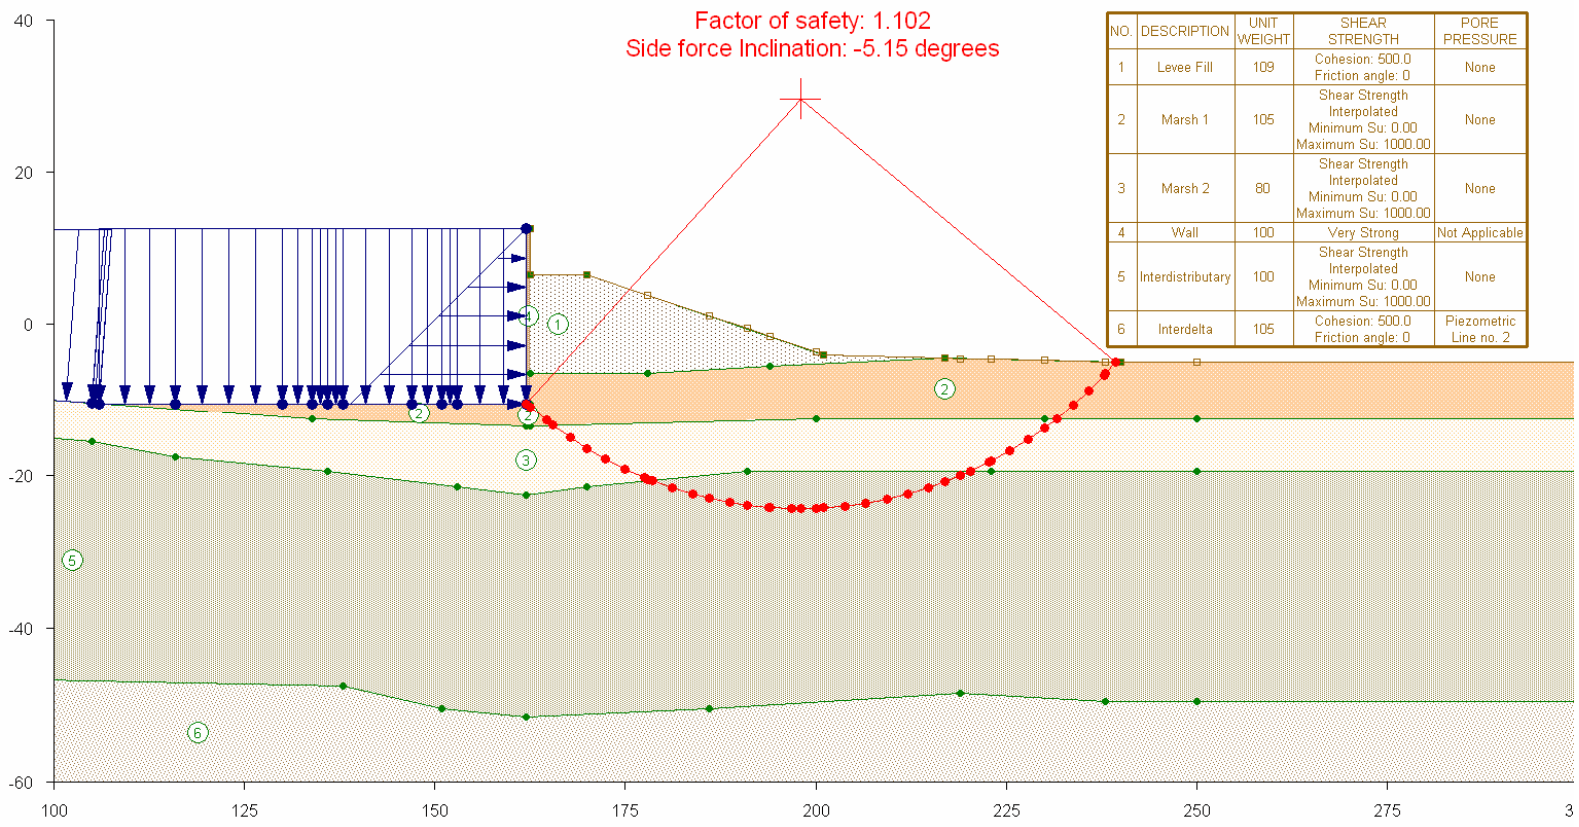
IHNC – East Bank (South Breach), Case 4, Canal Water Level = Top of Wall - 12.5 ft (NAVD 88), with Crack
